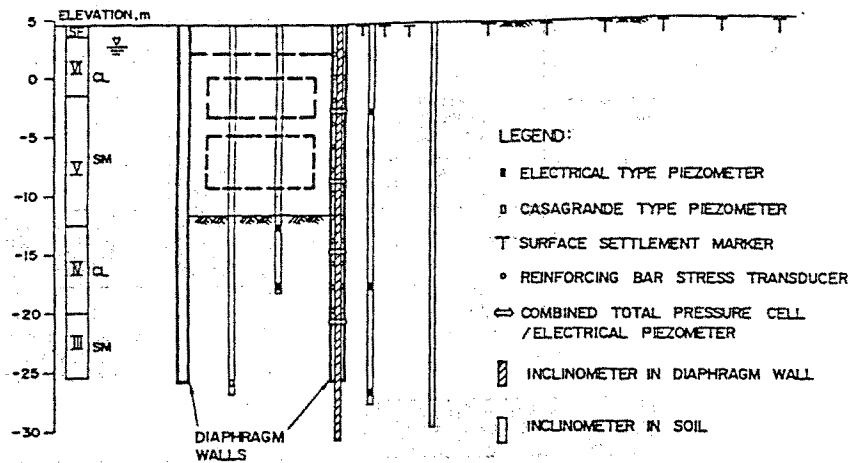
Typical Instrumented Section (after Moh and Chin, 1991B)
